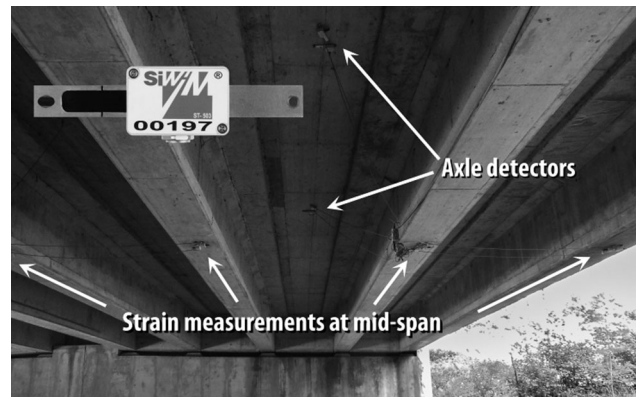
B-WIM instrumentation of a beam-and-slab bridge.
